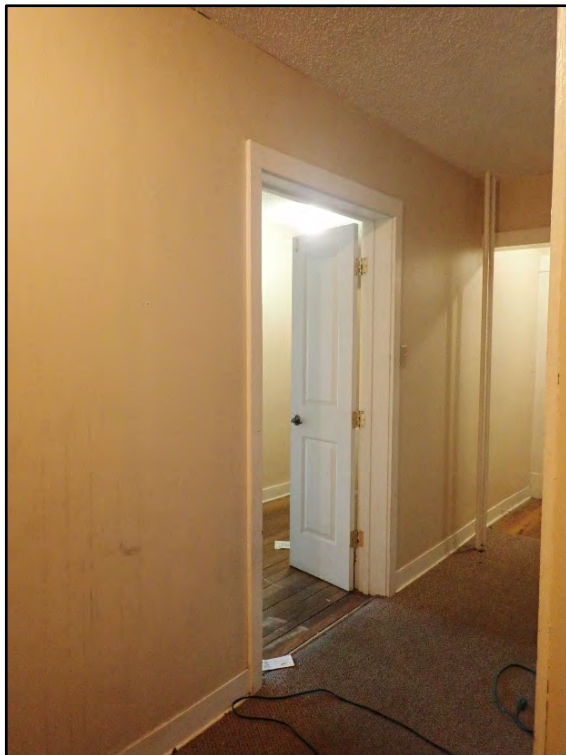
One last look down the hallway to the bedrooms in the original part of the house.
